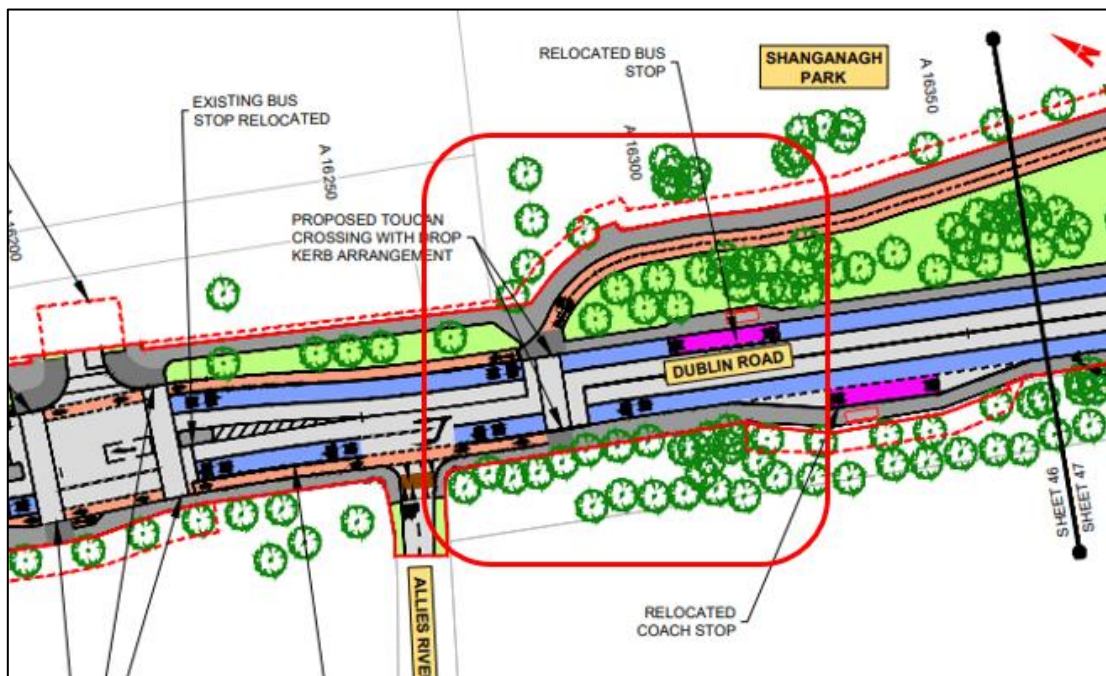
Extract from General Arrangement Drawings showing Proposed Toucan Crossing at Chainage 16+280 (Sheet 47)
